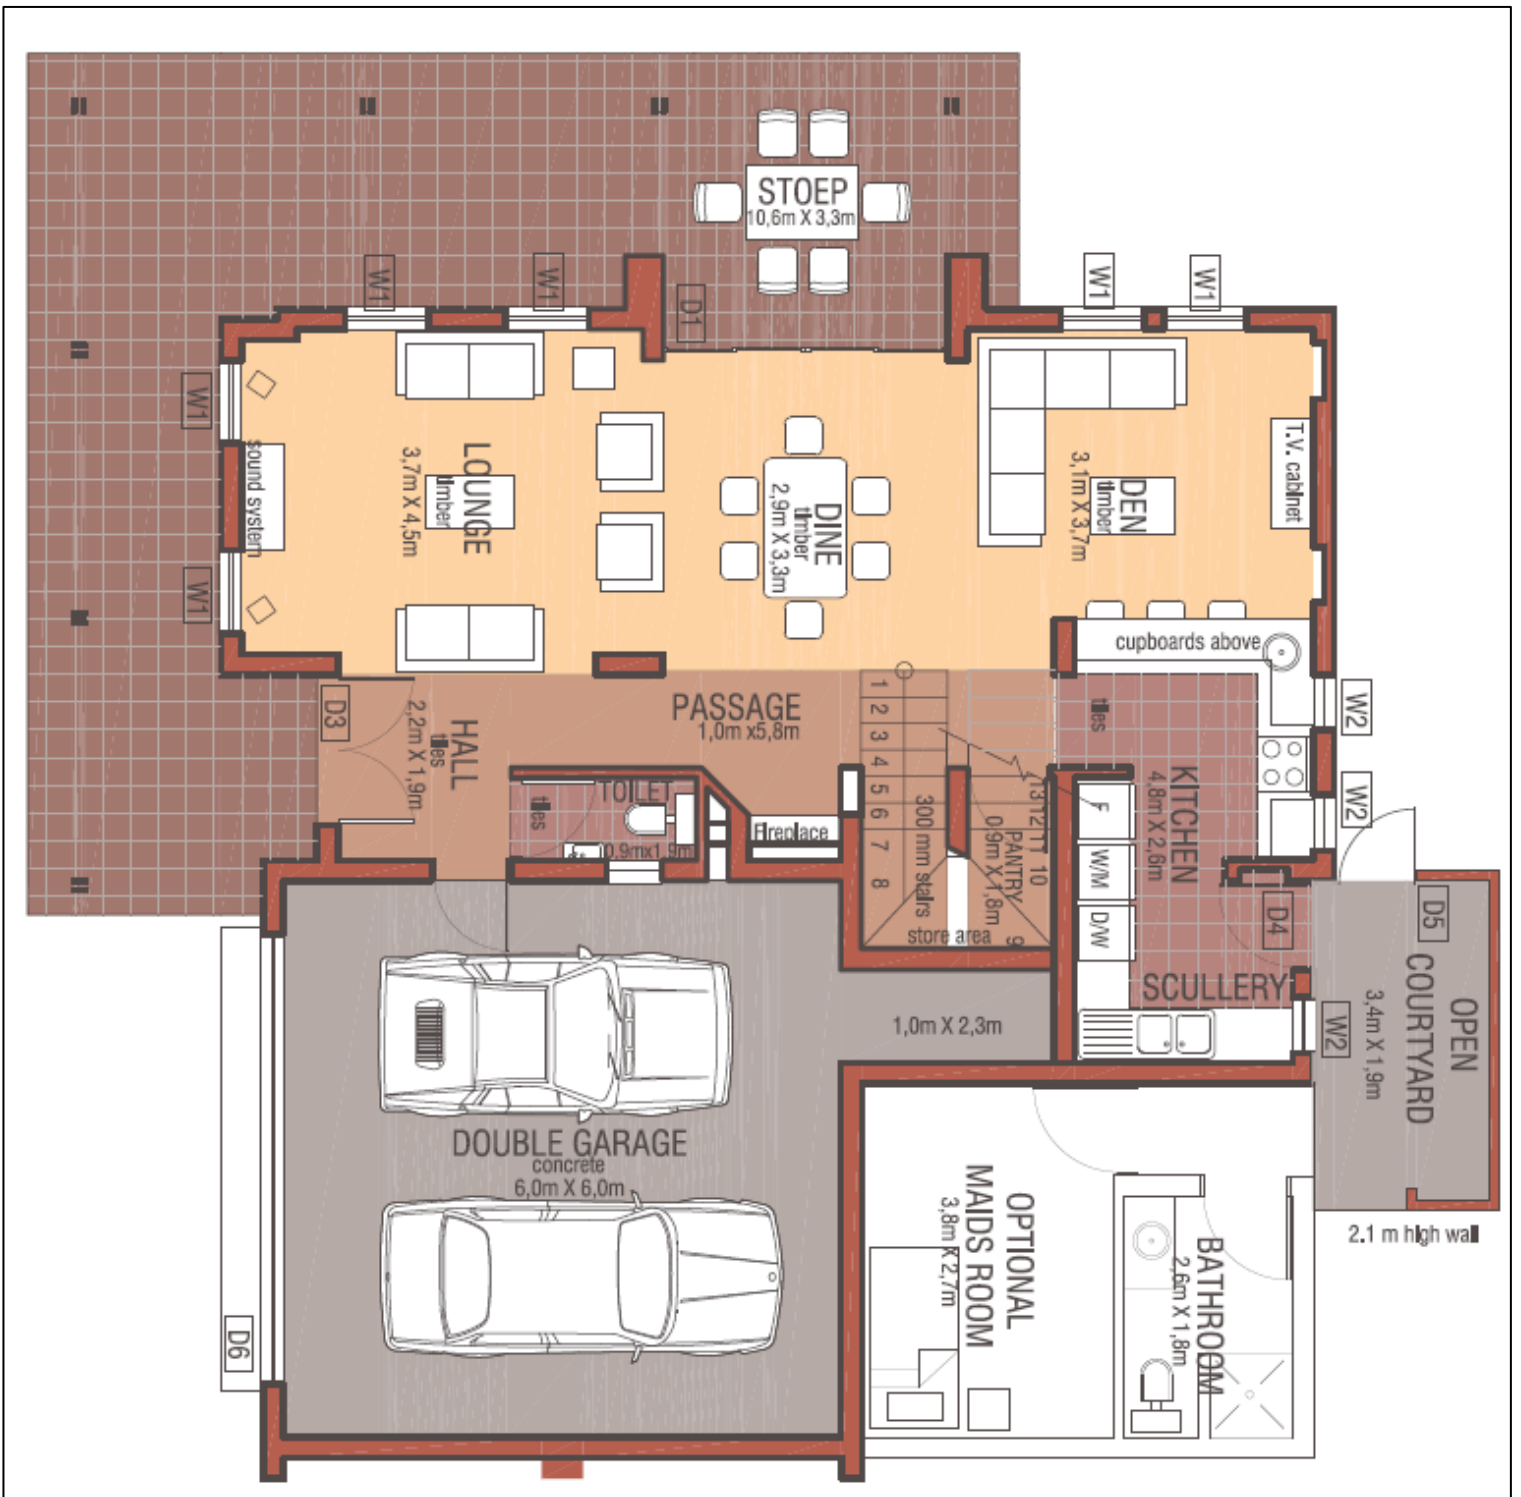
Layout of type-D ground floor (Arlington representation, 2008)
